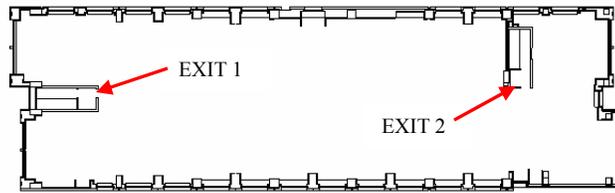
An AutoCAD drawing of Floor 3 – adjusted to Floor 0
